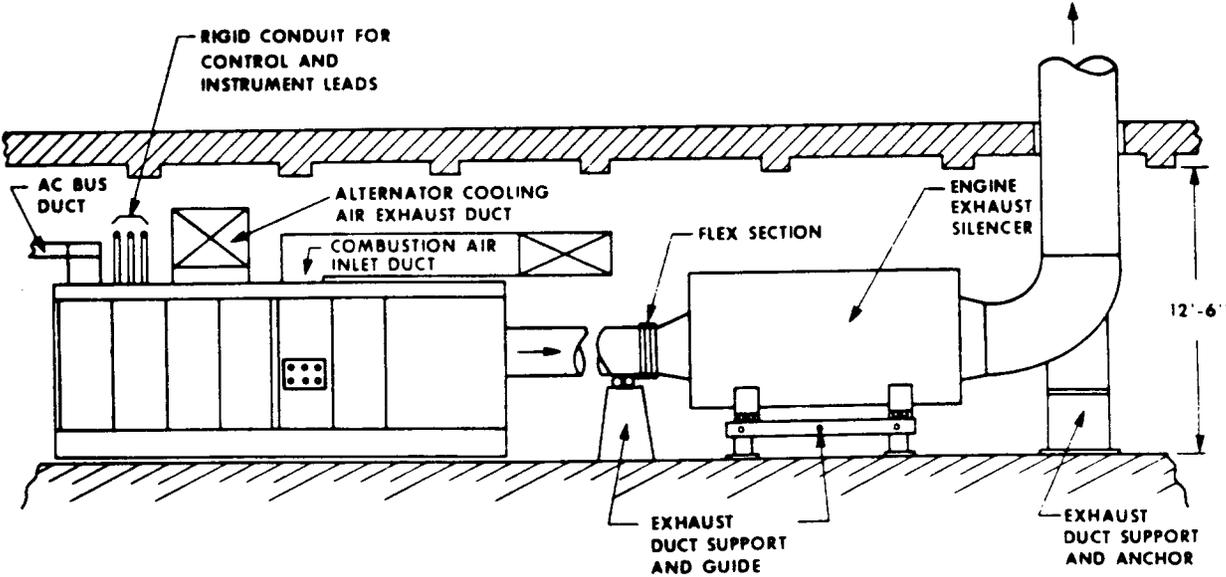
Typical Megawatt Engine Plant Equipment Area
